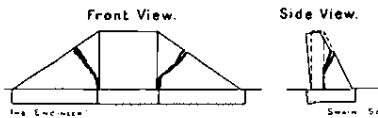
CRACKED BRIDGE ABUTMENT
